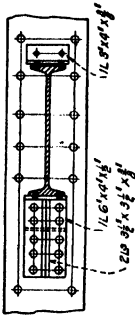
Standard connections beams to columns for 20-in. I-beams with reactions not more than 53,000 lb.
